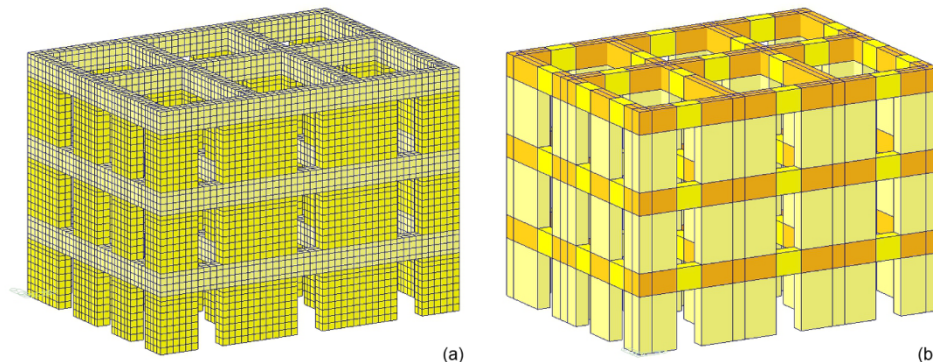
Building modelling approach: solid element (a) and beam element (b)
